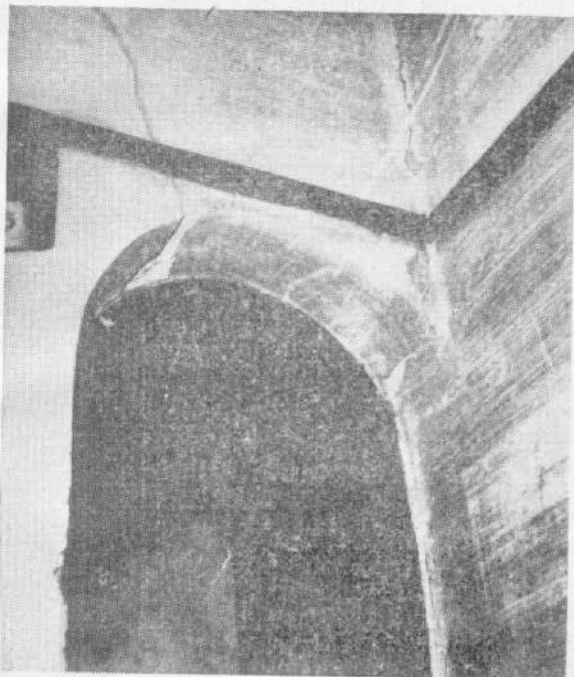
Damage of masonry arch in cross wall in Henry's masonry Block No. 4, with development of crack along the junction of the main wall.
